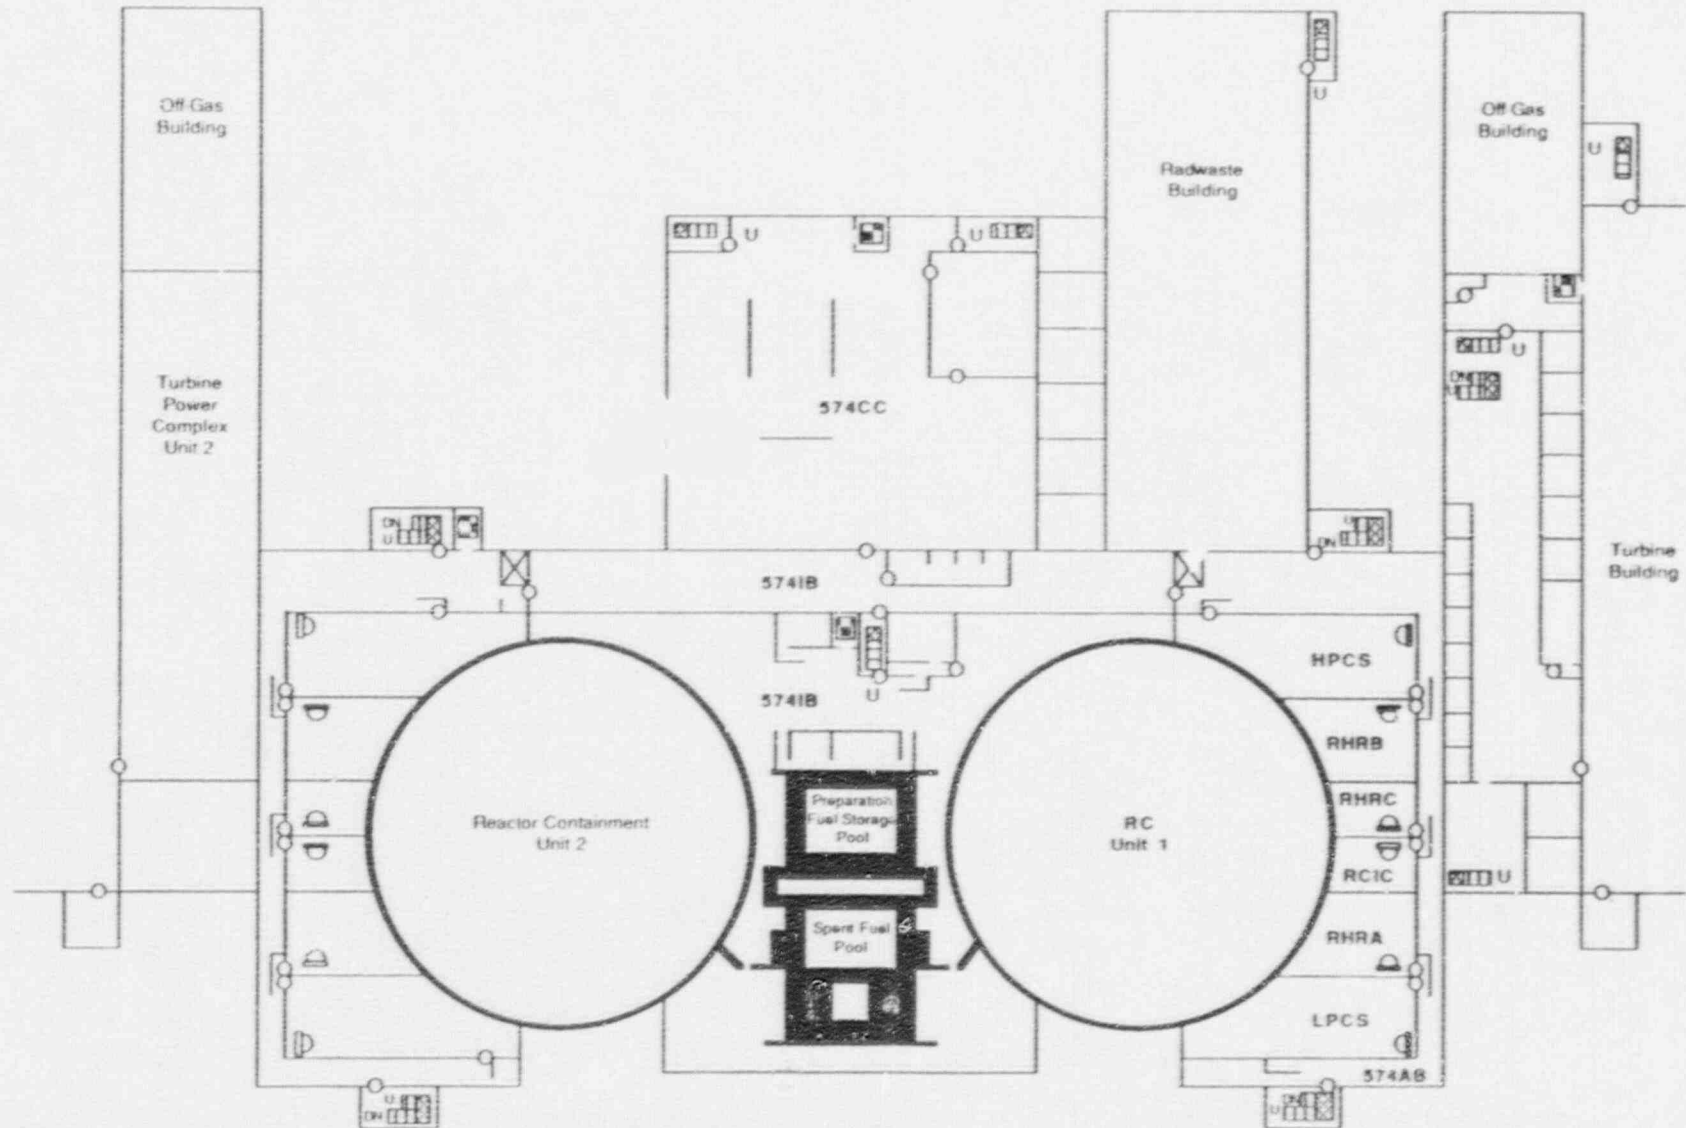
Perry 1 and 2 Reactor Building Elevation 574'10", Auxiliary Buildings Elevation 568'4", Intermediate Building Elevation 574'10", Control Complex Elevation 574'10", and Turbine Power Complex Elevation 568'6"
